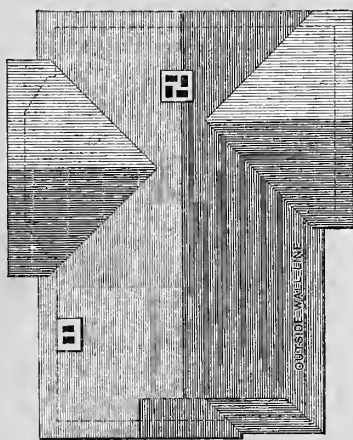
Roof Plan.—Scale, $\frac{1}{16}$ Inch to the Foot.
